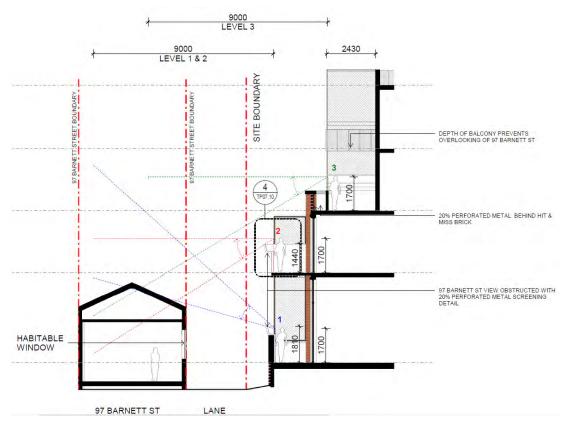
Overlooking Section 2 depicting proposed overlooking mitigation measures. From Drawing TP07.10
